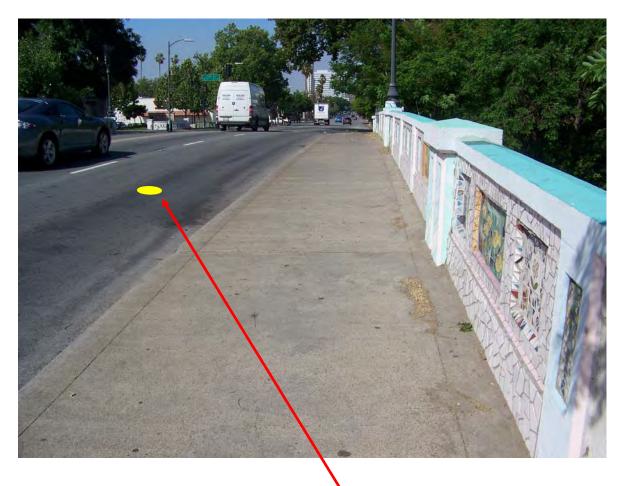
of 8. View looking westbound at Santa Clara Street bridge deck surface.
